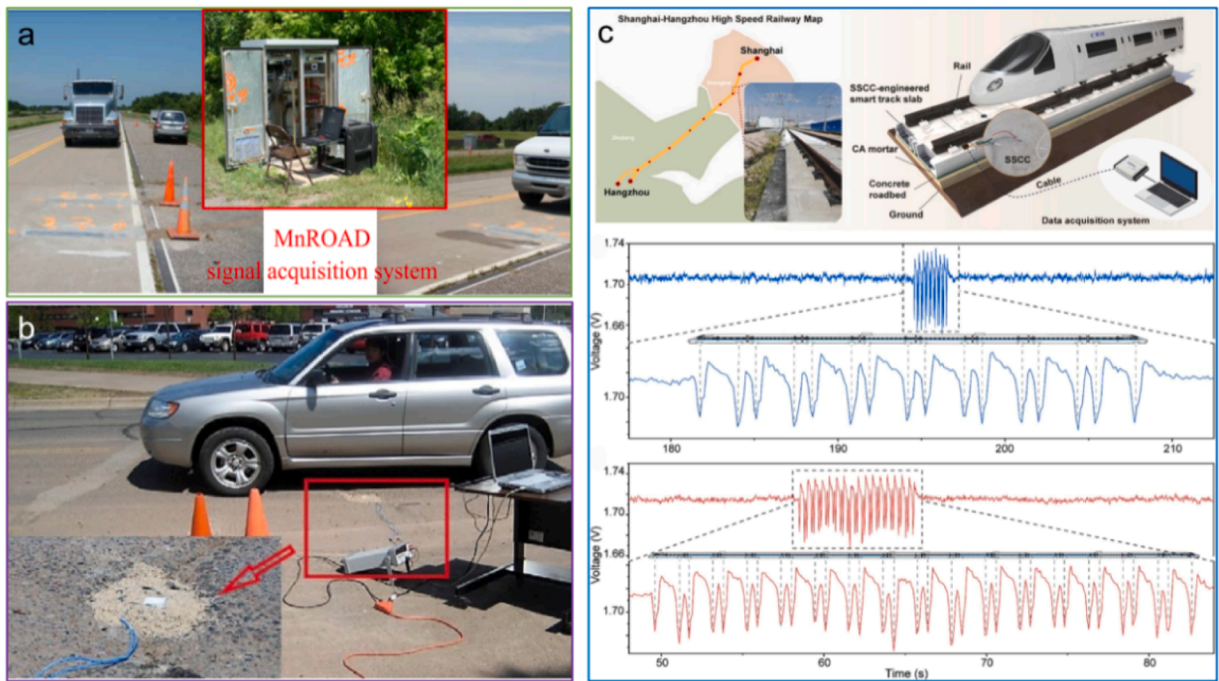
Practical applications of SSCC in the field of information detection for concrete infrastructures, such as concrete pavements and bridges: (a) utilization of CNT-based SSCCs for road information testing [148]; (b) Vehicle load testing of CNT-modified SSCCs embedded in concrete pavement [149]; and (c) SSCC track panels for high-speed railway monitoring [150].
